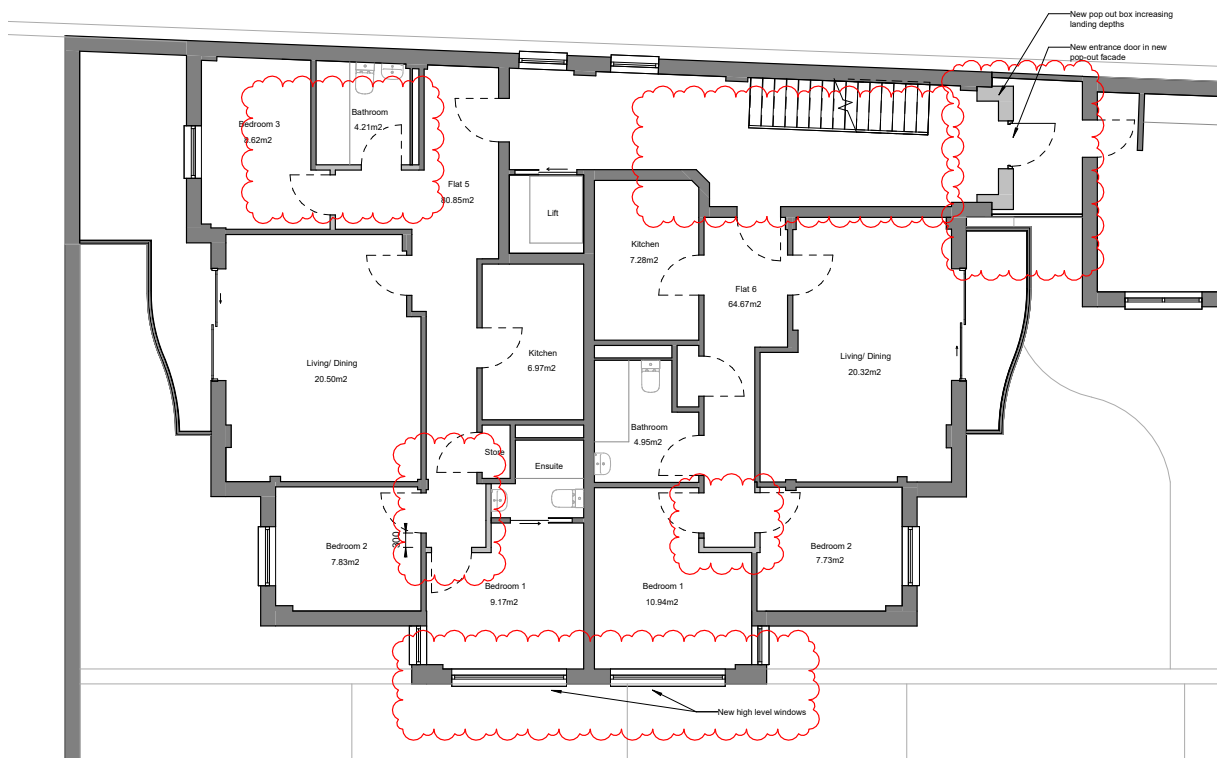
BLOCK 3 PROPOSED FIRST FLOOR PLAN
